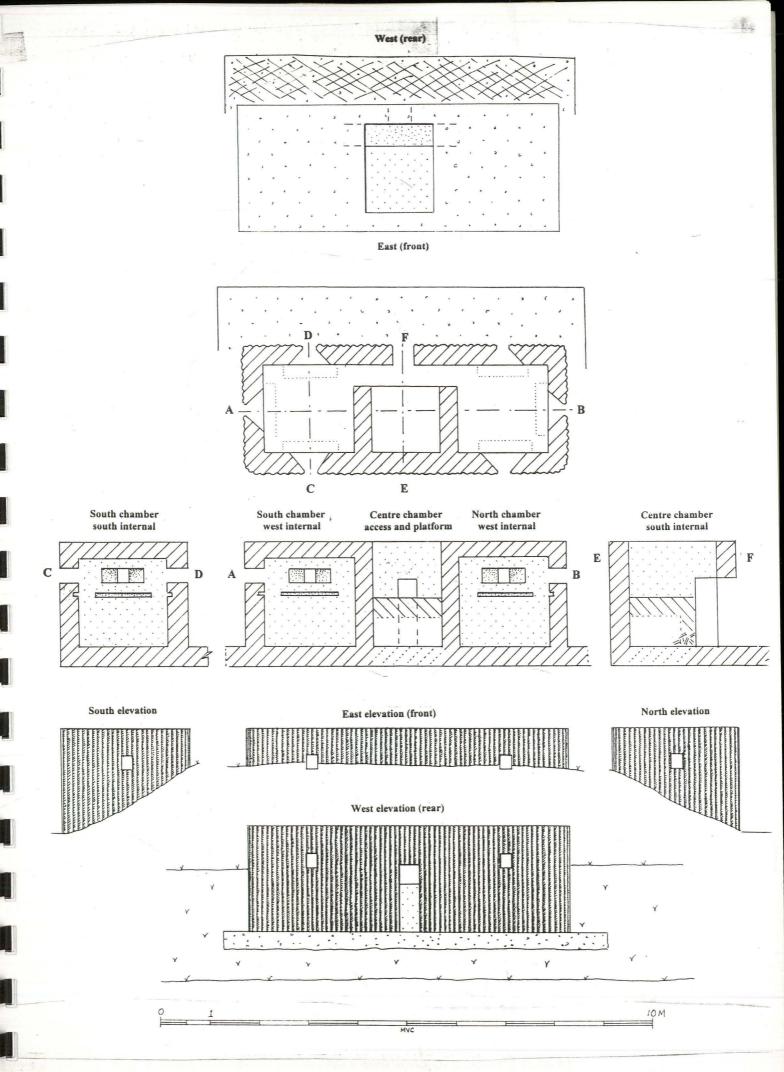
Plan of pillbox 1, plans, cross-sections and elevations of pillbox 3 (Clark).
